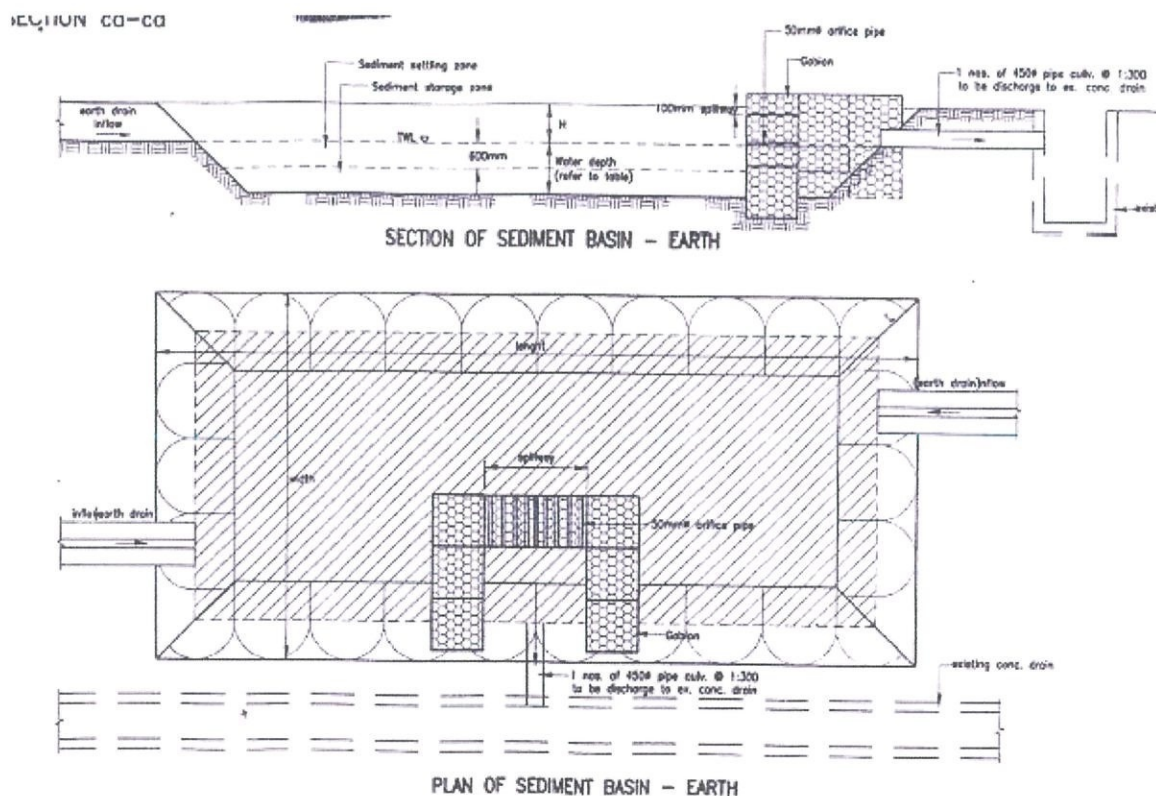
12 Cross Section of Sediment Basin as shown in drawing
